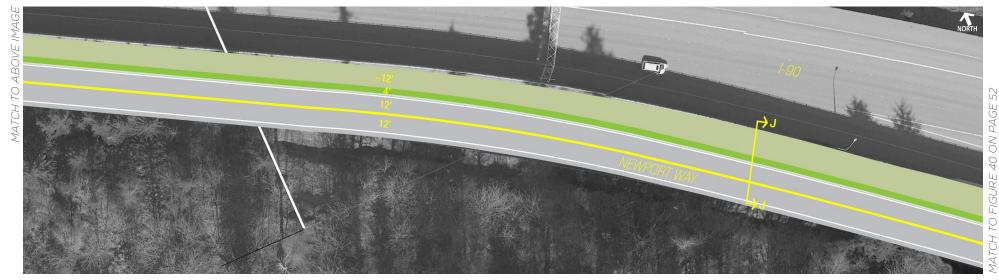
Trail between the existing pedestrian bridge over I-90 at SE Newport Way and Lakemont Blvd SE.
